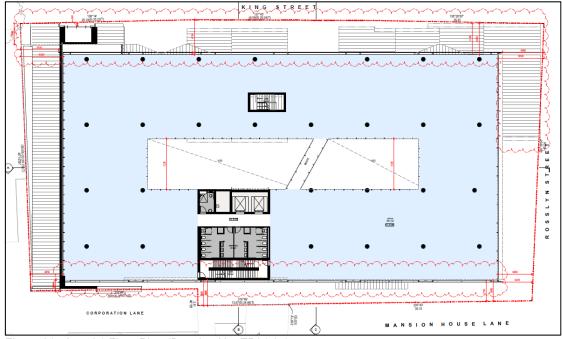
Level 1 Floor Plan (Drawing No. TP01.07)
